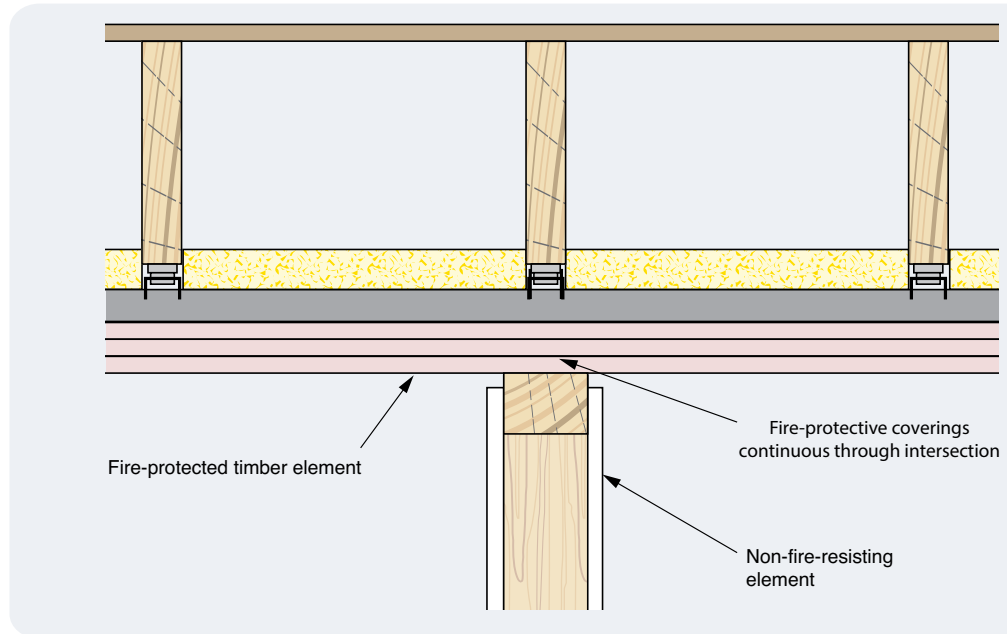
Junction of non-fire-resistant wall and fire-protected timber floor.
